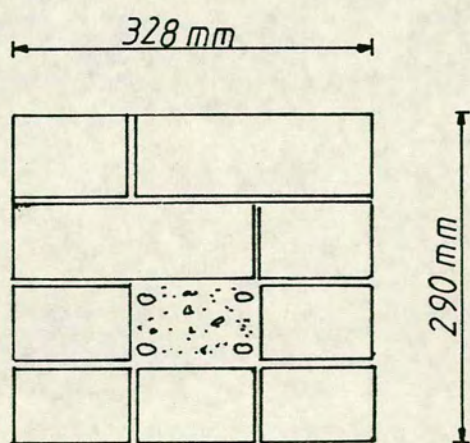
Beam Section of ROBSON et al⁽²⁶⁾
